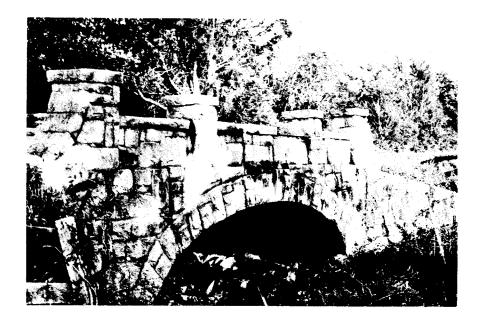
Unusual stone-faced concrete arch bridge built in Halifax County.
